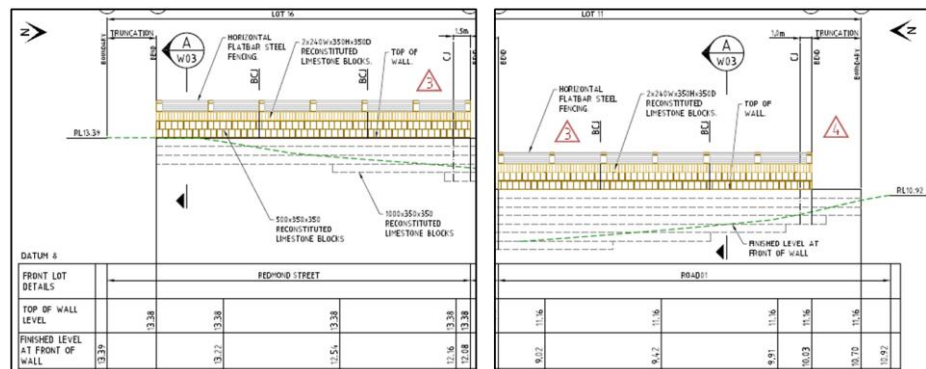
Proposed Lot 16 and Lot 11 Street Fencing (on Top of Proposed Retaining Walls)
